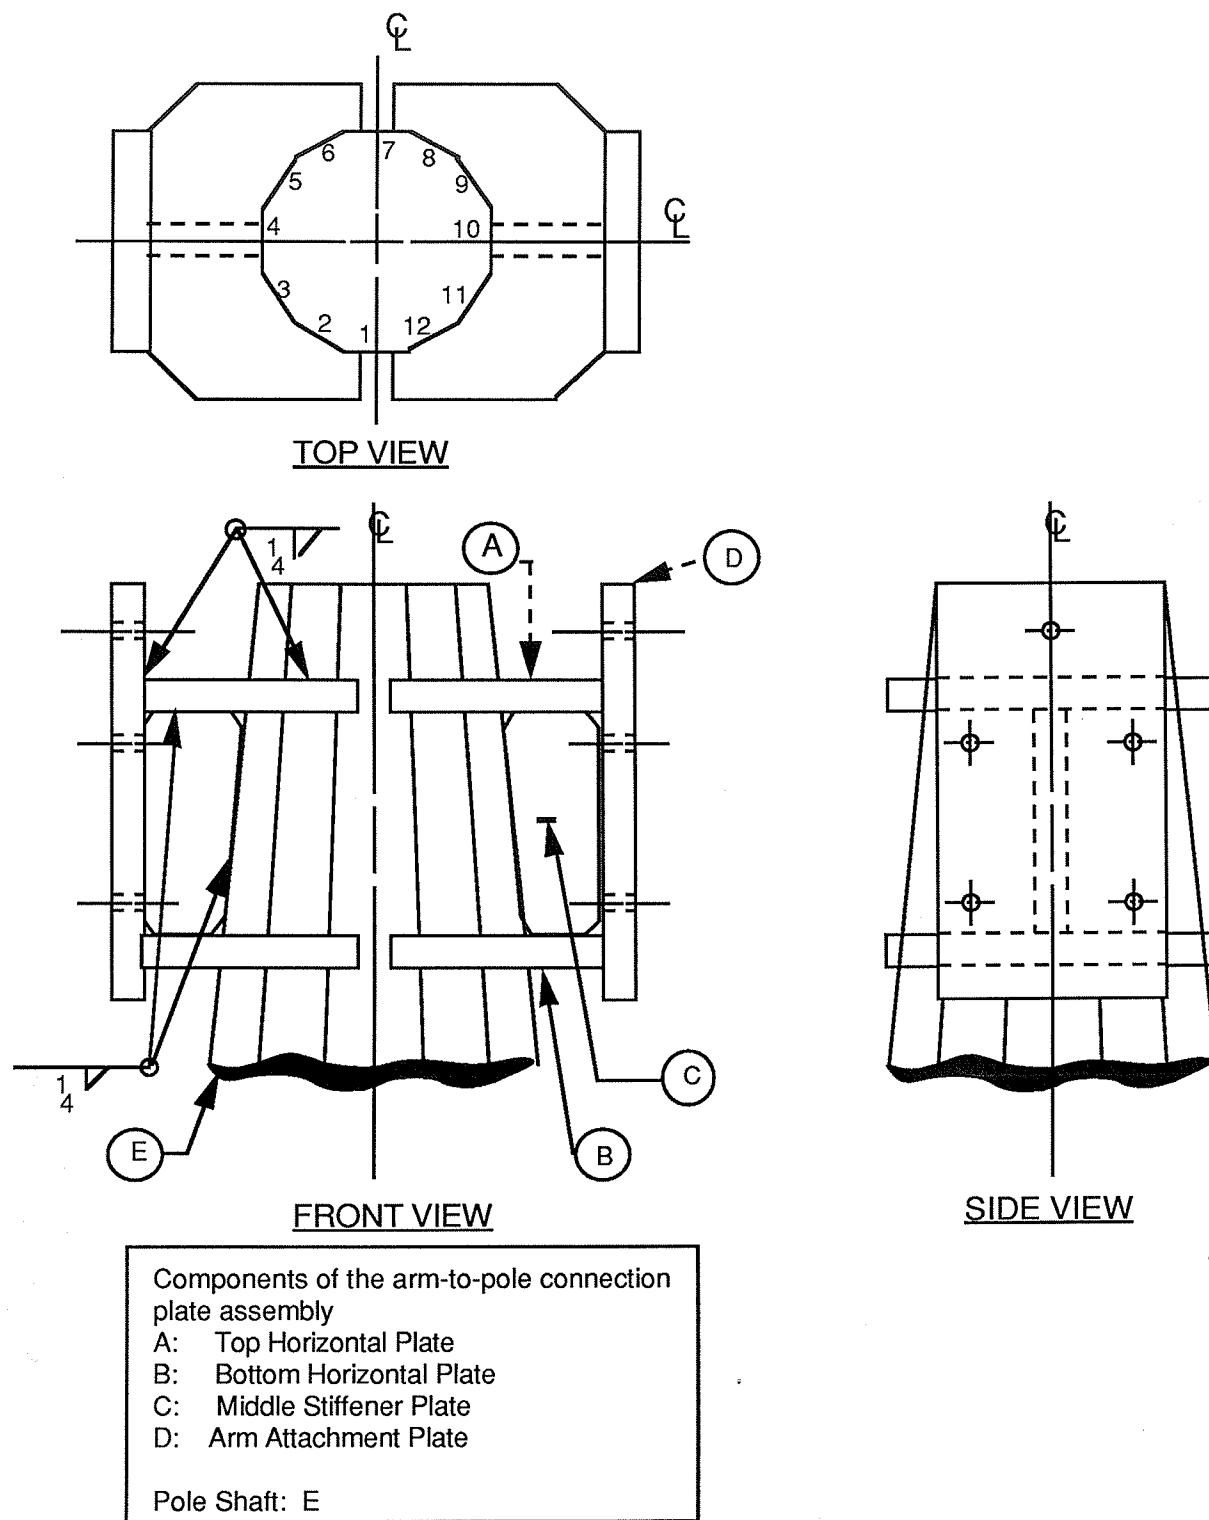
TYPICAL STATIC ARM-TO-POLE CONNECTION PLATE ASSEMBLY. The pole arms are connected to the shafts of the basic pole via plate connections welded together into complex assemblies. This figure shows a typical connection assembly of the static arm to the pole shaft.
